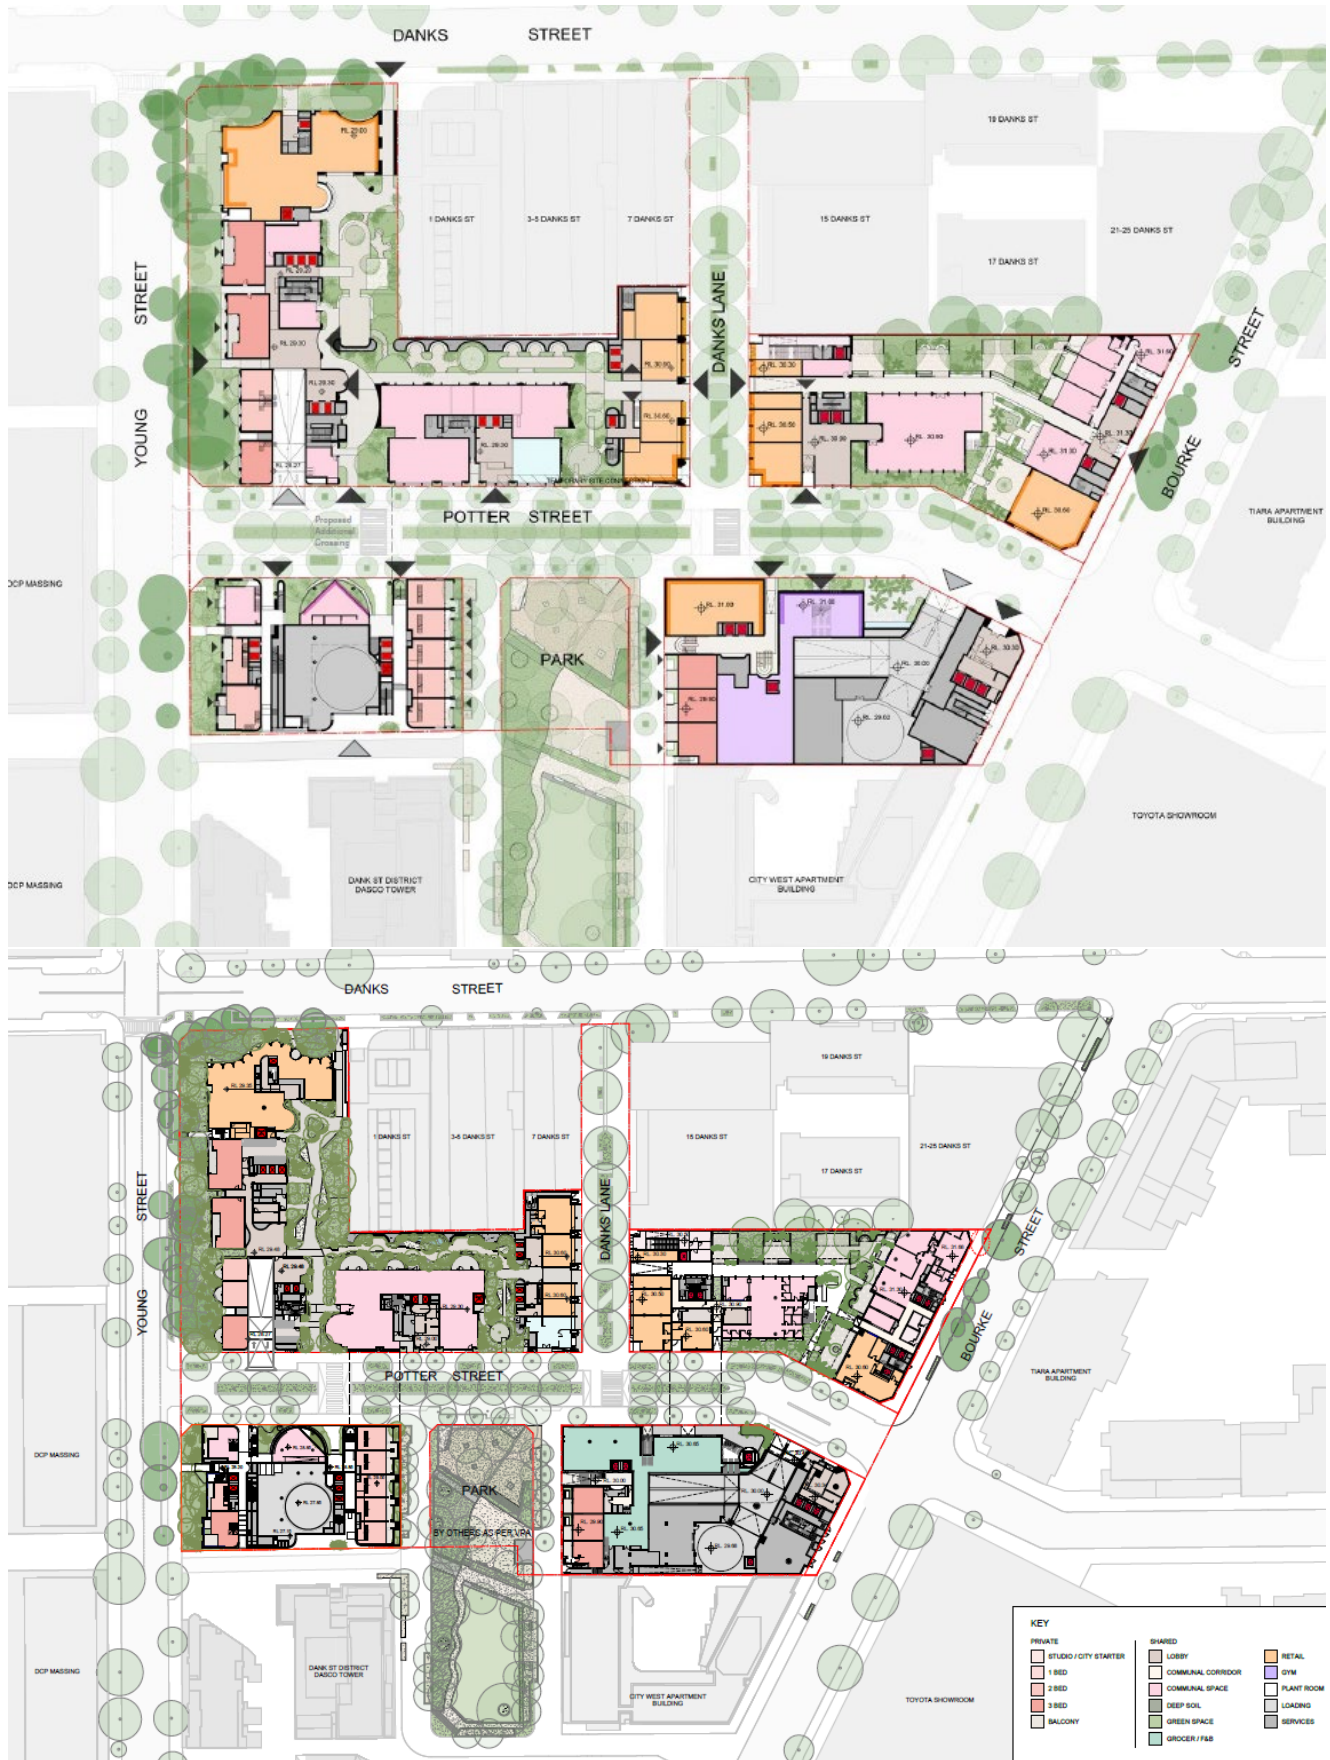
Comparison of SSDA Submission (above) and Amended Plans (below) Precinct Ground Floor layout and uses
